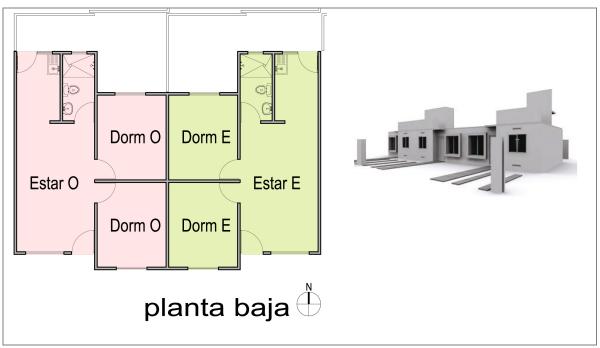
Adosada building type. Floor plan and 3D model, no scale Source: [Campos 2011]
